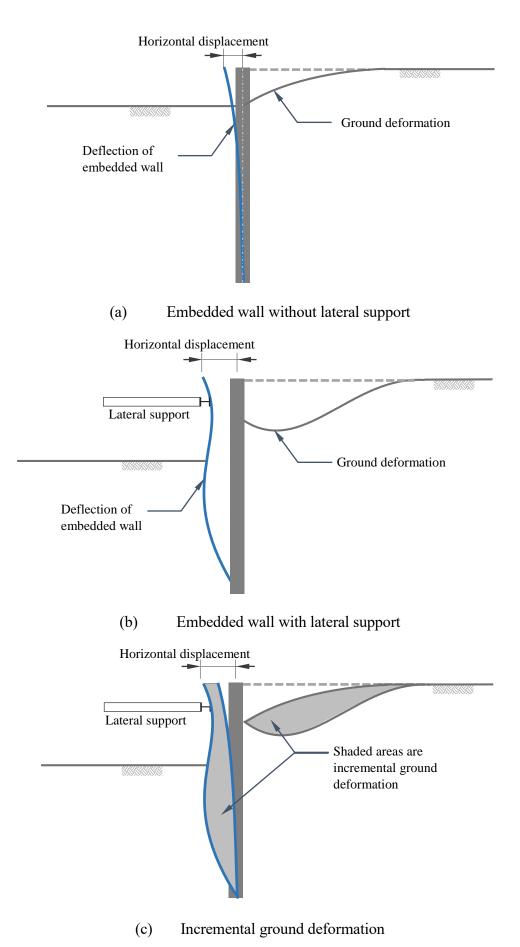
Typical Profiles of Wall Deflection and Adjacent Ground Deformation (modified from Clough & O'Rourke, 1990)
